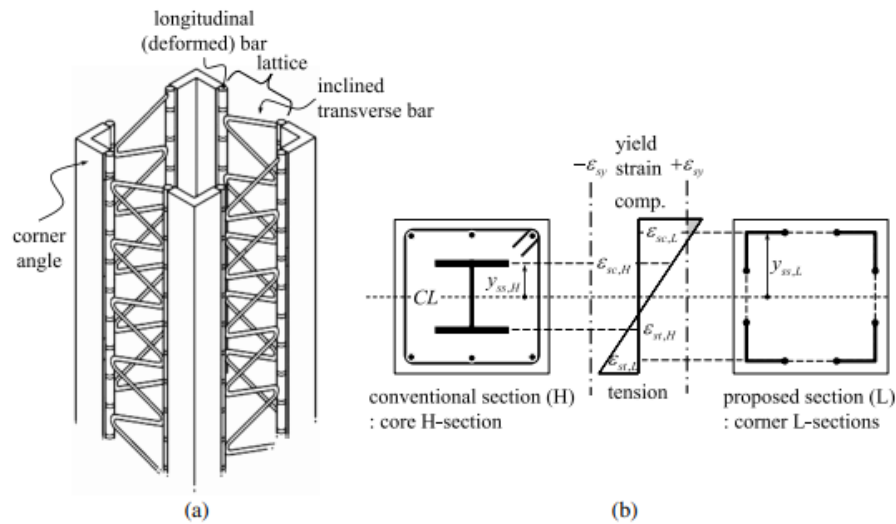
Concrete encased steel column with L corner sections: (a) prefabricated steel section with lattices, (b) strain distribution in steel sections. Kim et al. (2014)
